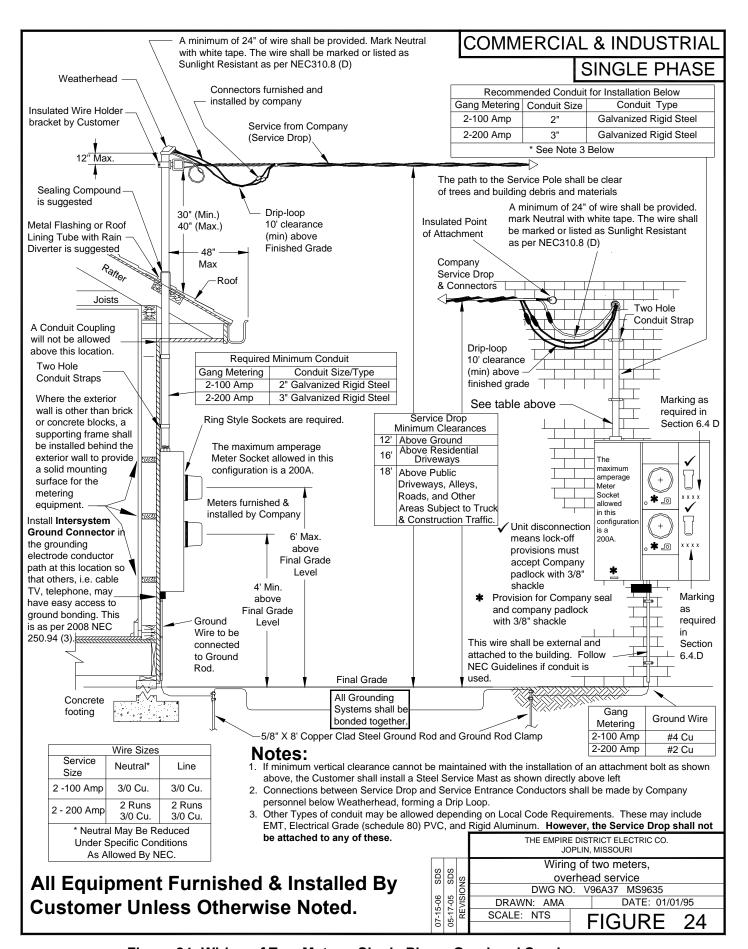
Wiring of Two Meters, Single Phase Overhead Service
